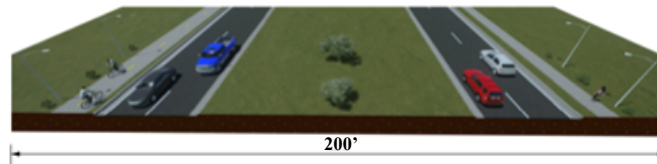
West Connector 200 feet ROW Typical Section from FM 1863 to 3200' of FM 1863
